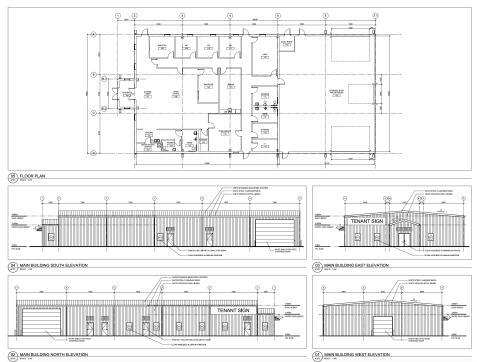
Proposed Floor Plan and Elevations for Main Building
